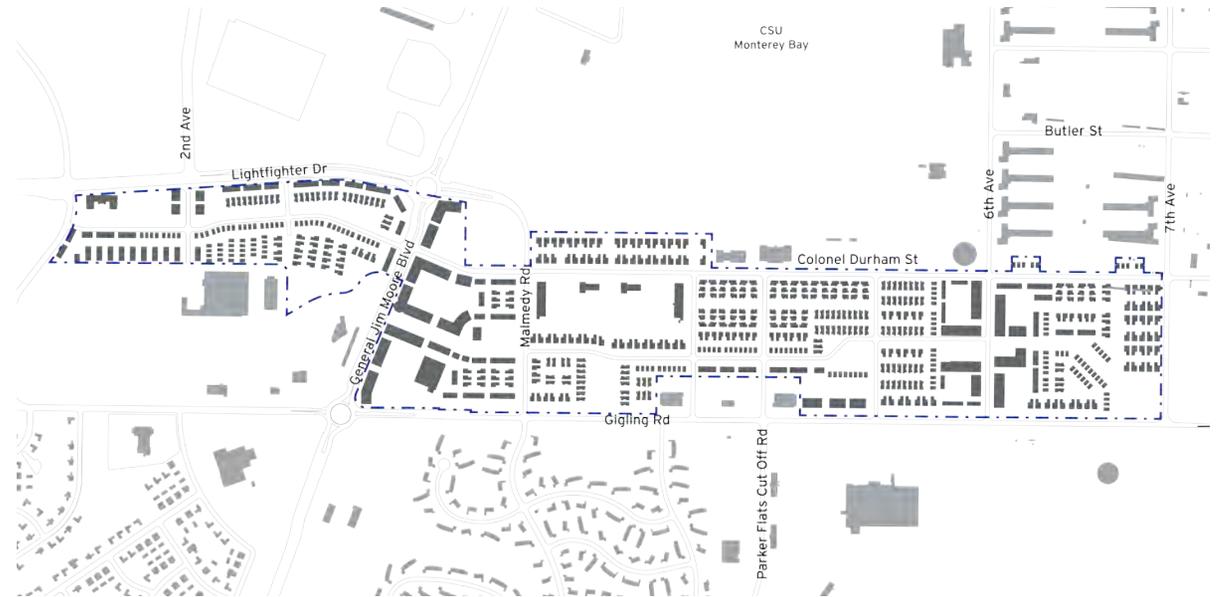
Conceptual Figure Ground Plan Diagram
